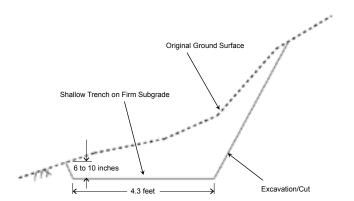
Excavation of shallow trench or leveling pad in approved native soil
